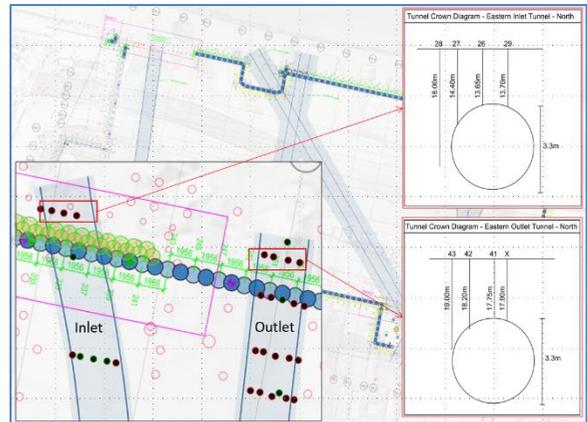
Advance probing above secant pile retaining wall alignment to locate cooling water tunnels
